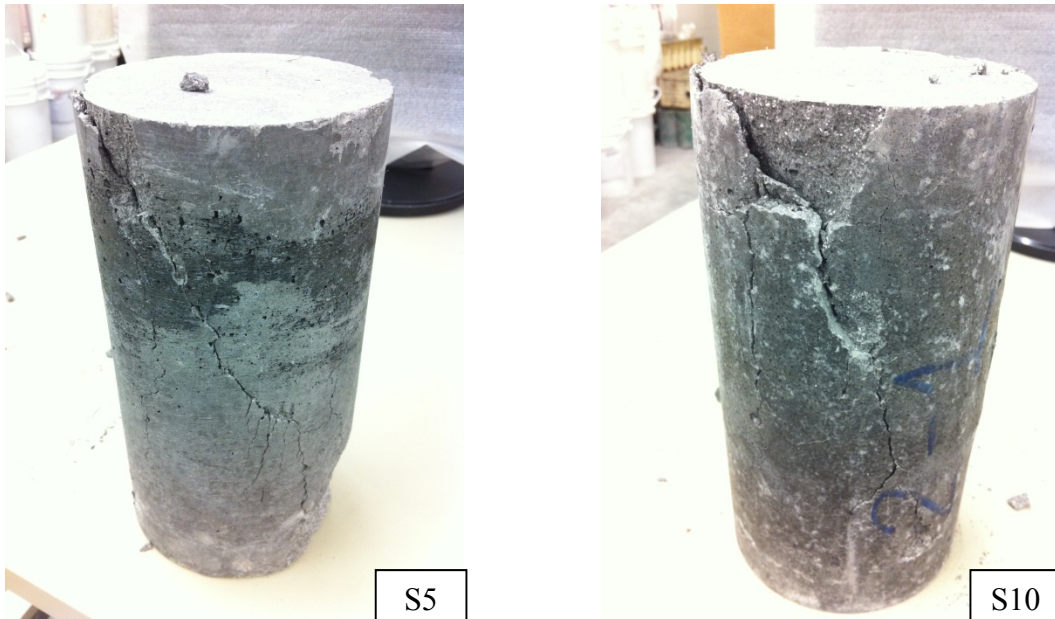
Typical failure of cylinder specimens of mixes S5 and S10
